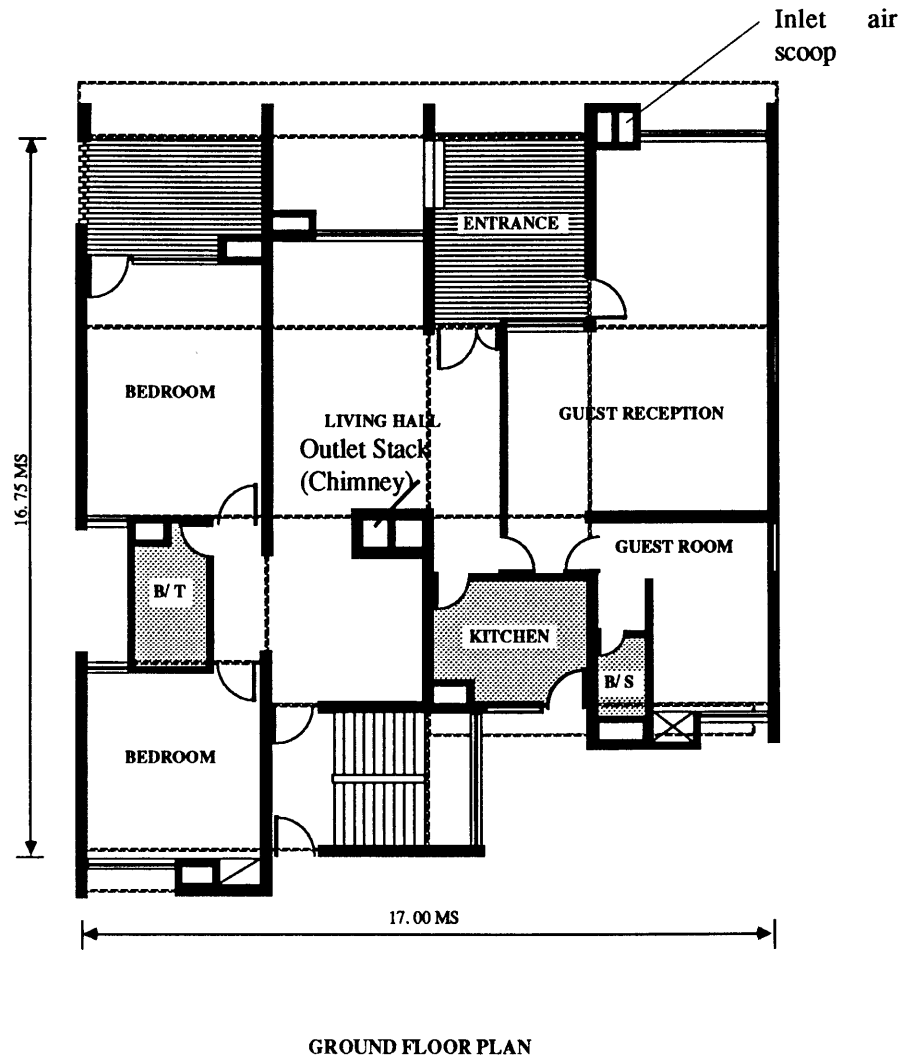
The previous House plans represented in this Appendix can be environmentally modified and controlled by adding a chimney and air scoop in the existing spaces.
